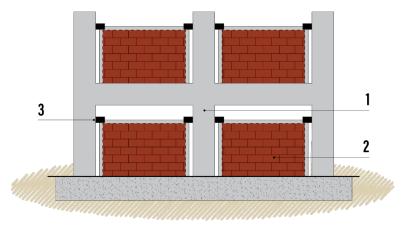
A reinforced concrete frame with potential short columns (1) and masonry infill walls (2) confined by tie columns and tie beams. The infills are separated from the frame by vertical separation gaps but restrained at their top corners by steel brackets bolted to the columns (3). The brackets allow movement between columns and walls parallel to the walls, but prevent the walls from falling from the building during an earthquake.
